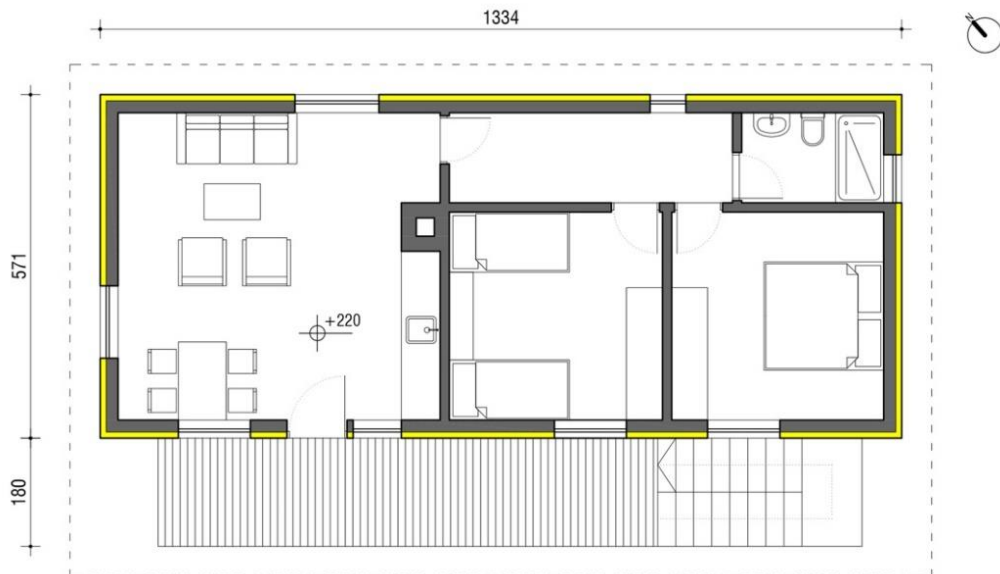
Renovation: Floor plan, Source: Mirko Stanimirovic
